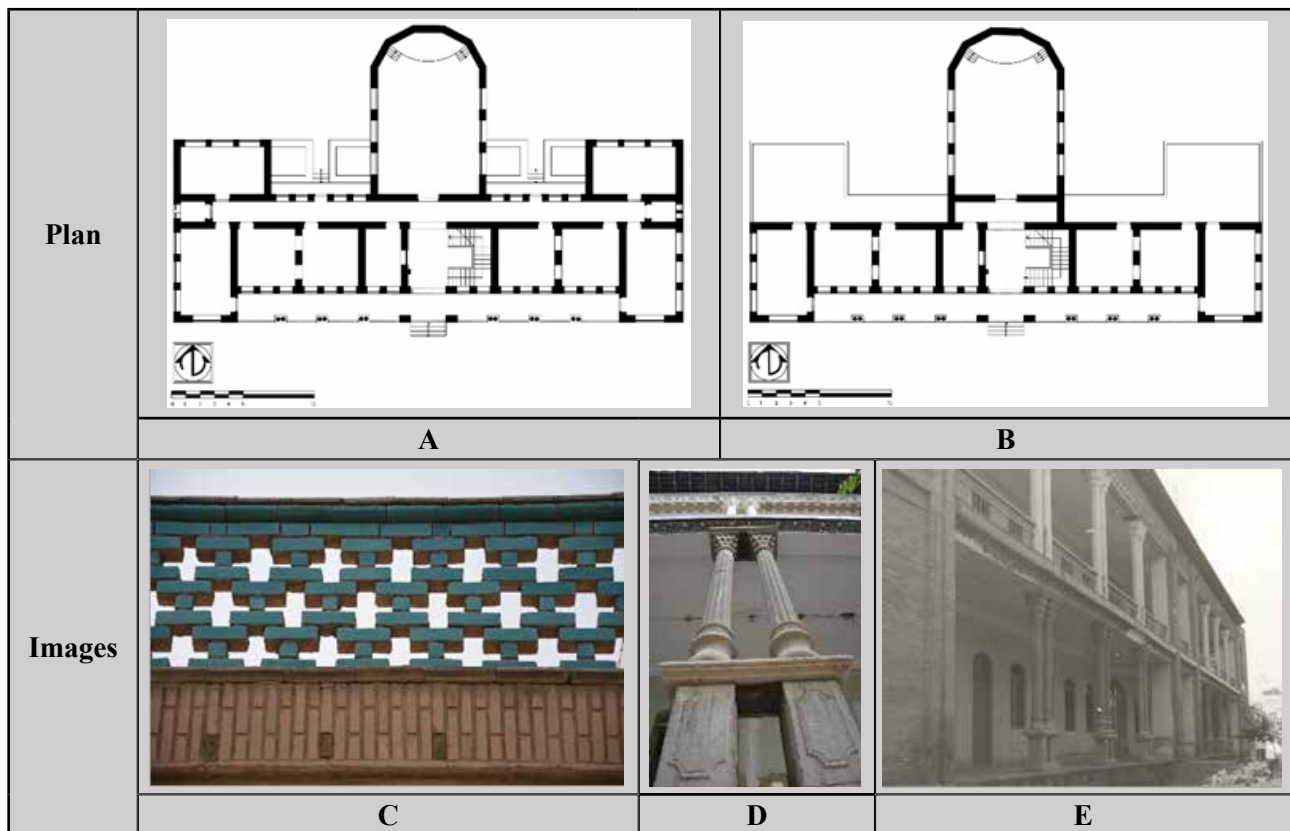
Saadi High School: A- Ground floor plan; B- First floor plan (Mapping: Authors); C- Building roof wall; D- Accouplement (Twin columns); E-South view. Photos: M. Karahmadi. Source of Fig. 5-E: Archives of Isfahan Museum of Education.
